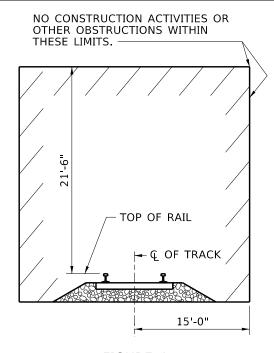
MINIMUM CONSTRUCTION CLEARANCE ENVELOPE (NORMAL TO RAILROAD)
